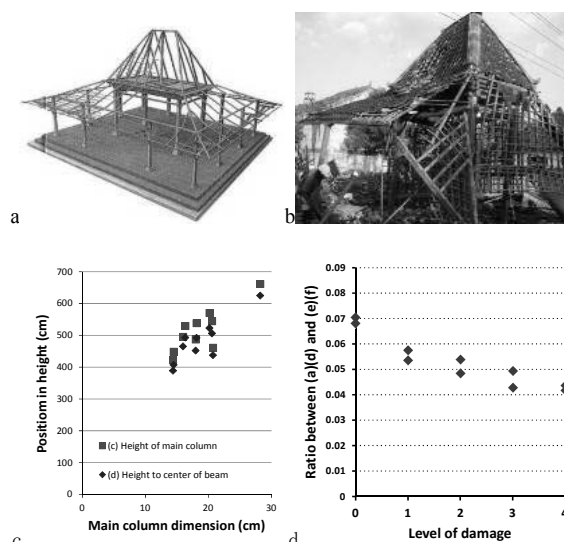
a. Joglo wooden structure; b Joglo damage by earthquake; c. Position in height against main column dimension; d. Ratio between column width/column height and short span/long span of core structure against level of damage.
